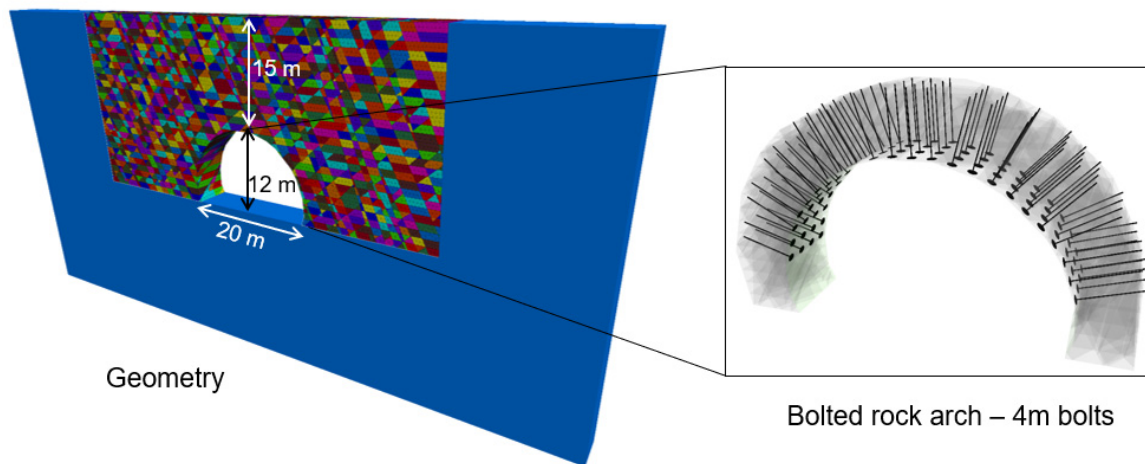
Model of a 20 m span arched shallow tunnel in fair to poor quality siltstone rock.
